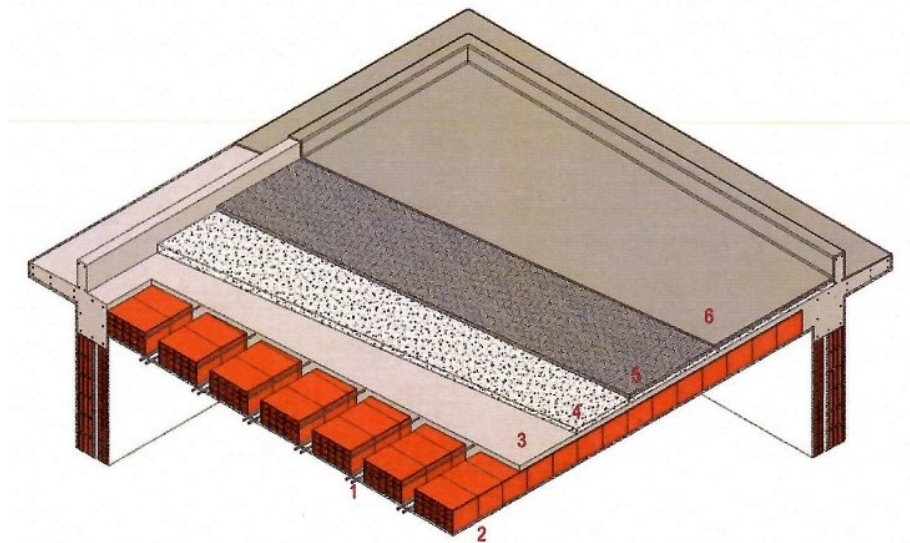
Reinforced concrete slab: 1) Steel reinforcement, 2) Brick infill, 3) Concrete slab, 4) Slope layer, 5) Insulation layer, 6) Waterproofing membrane.
